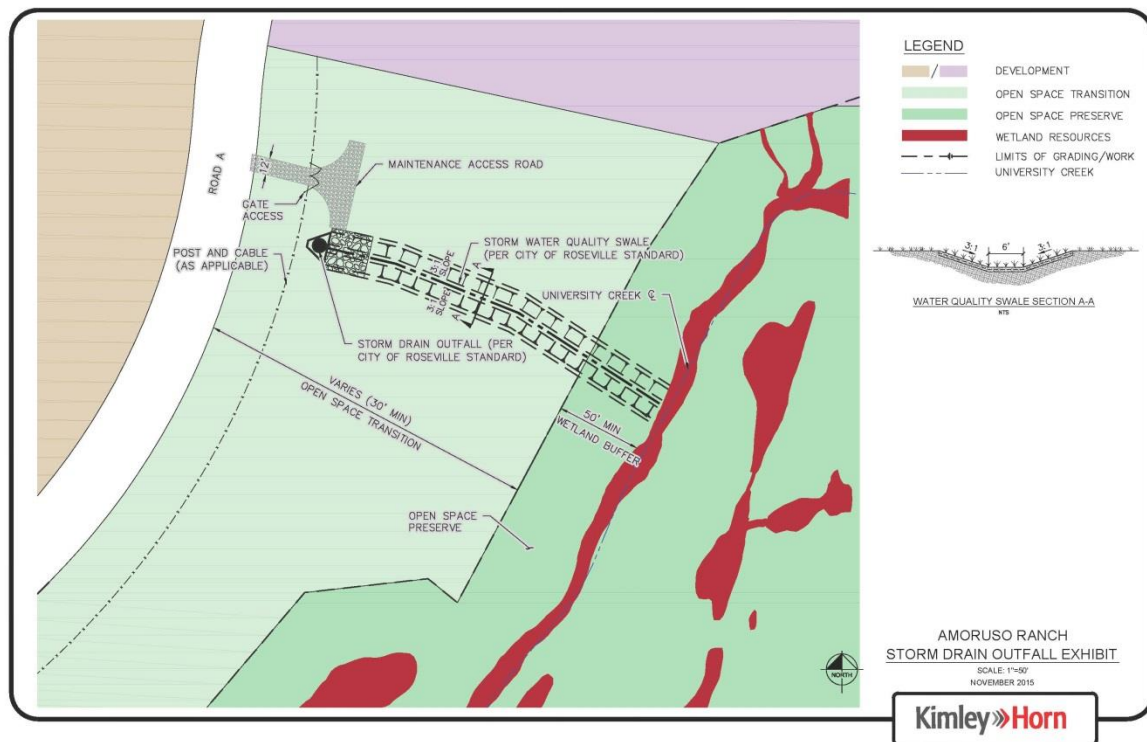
Amoruso Ranch Storm Drain Outfall Exhibit
